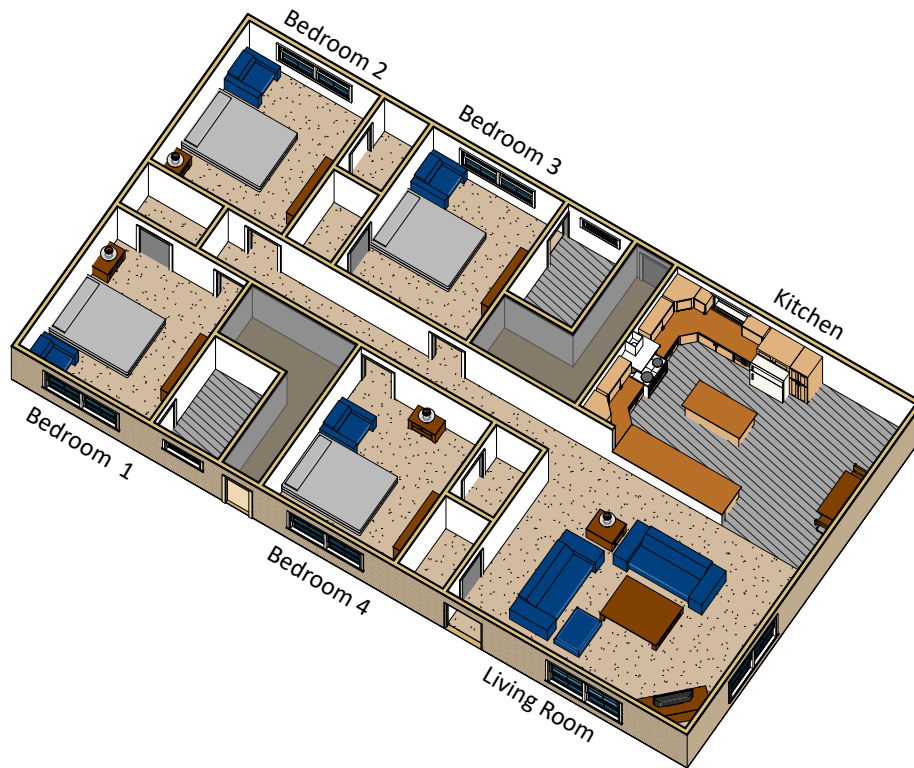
Layout of bedroom, kitchen, and living room fuels.
